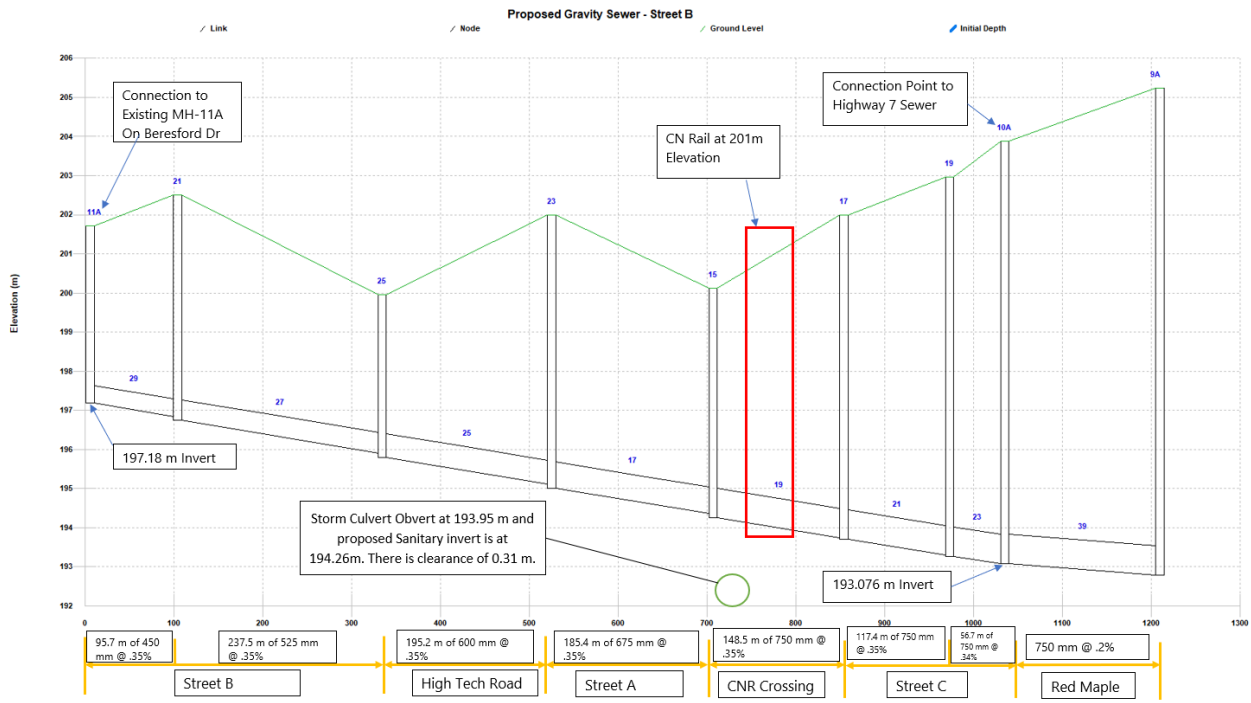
Street “B” Gravity Sewer to CNR Crossing
